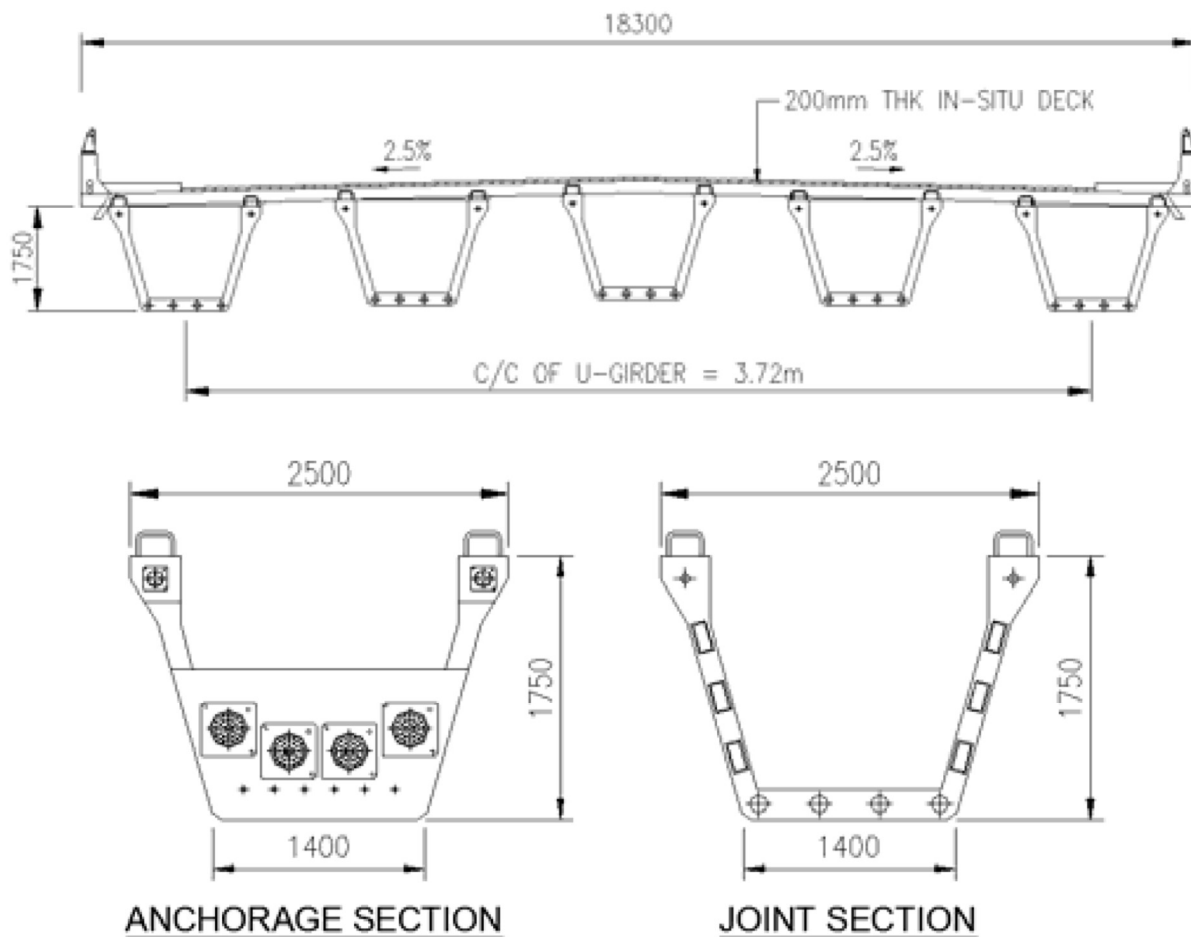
Cross Section of UHPC U-Beams of Rantau-Siliau Bridge (Voo, et al. 2014)
